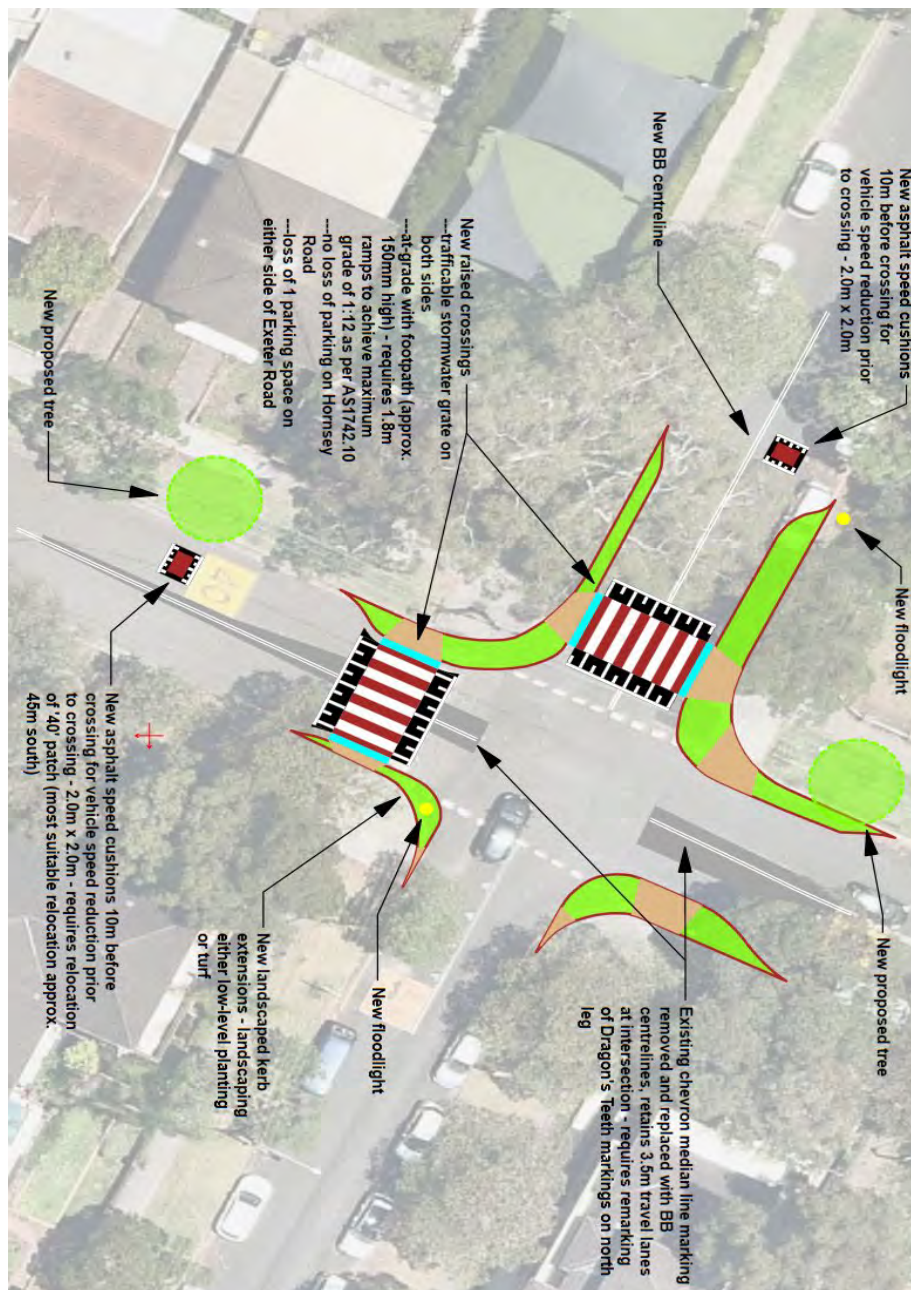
proposed crossings and kerb buildouts at the intersection of Hornsey Road and Exeter Road
